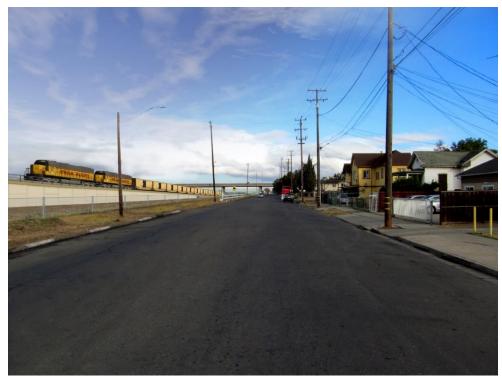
Project View of South Union Street with Retaining Wall Option
